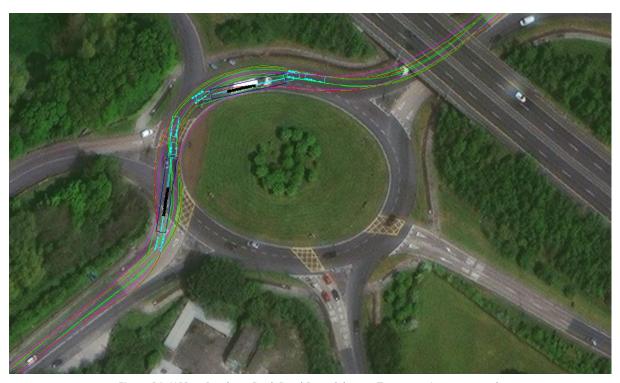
N69 to Southern Dock Road Roundabout – Tower section swept path
